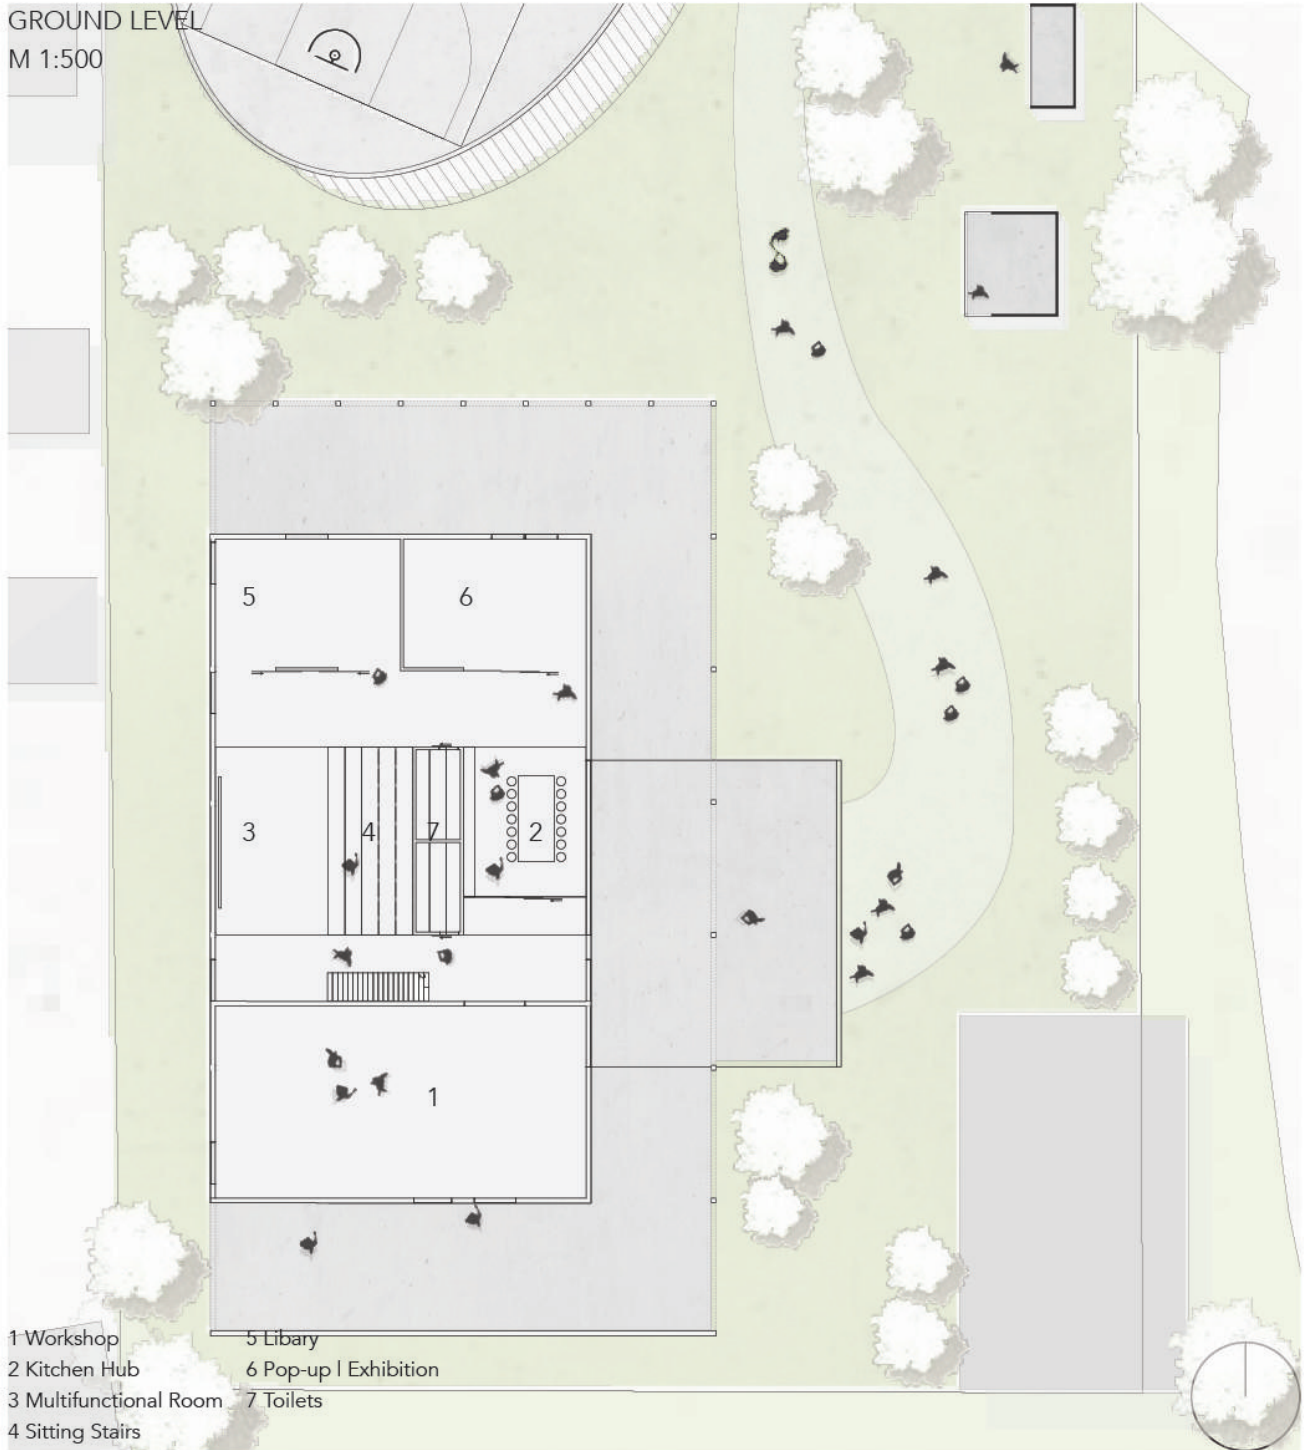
Creative Community Hub - Floor plan - Ground floor
